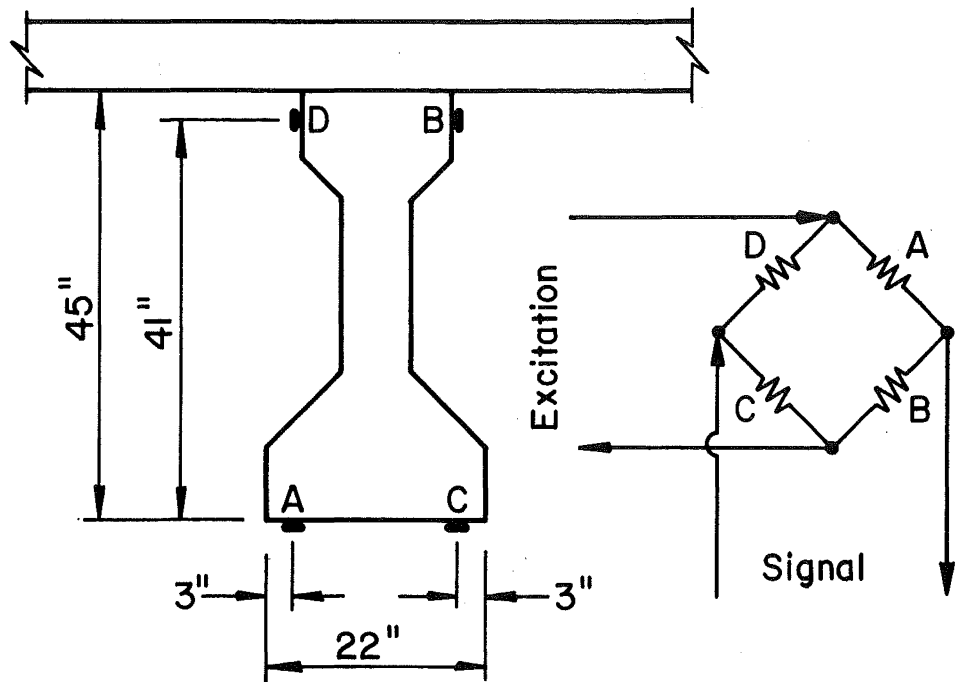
Typical Strain Gage Locations and Full Bridge Hookup
